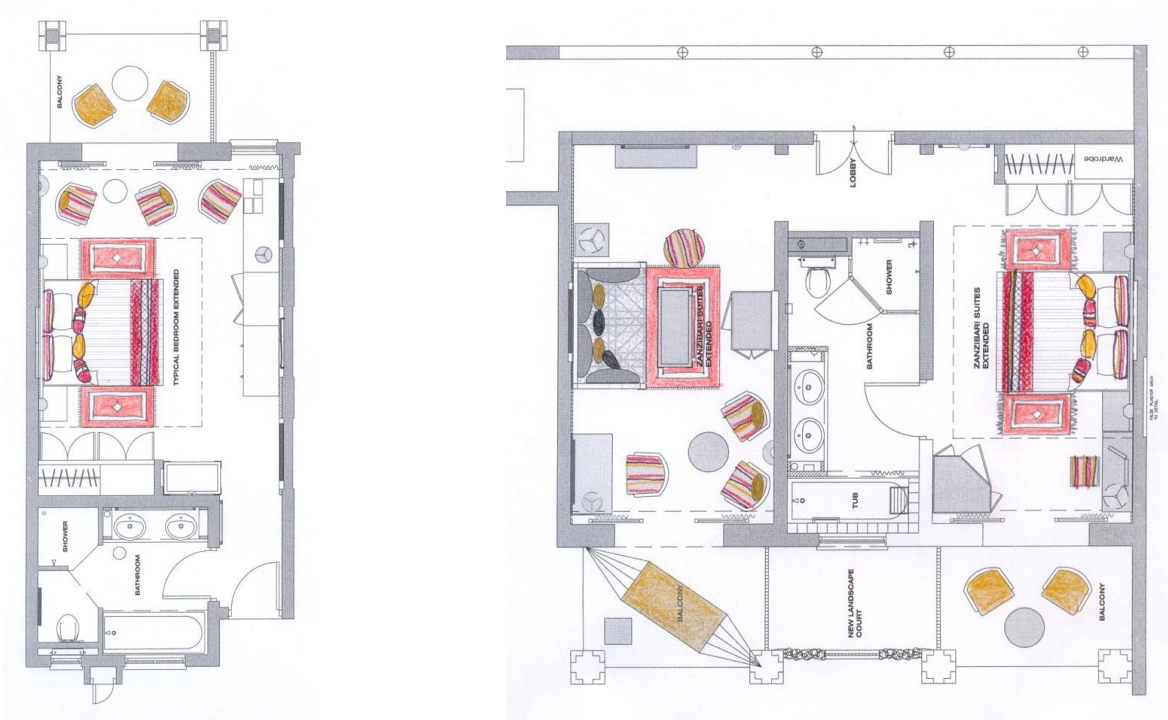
a Kikoyi Themed Guest Room Space Plans
